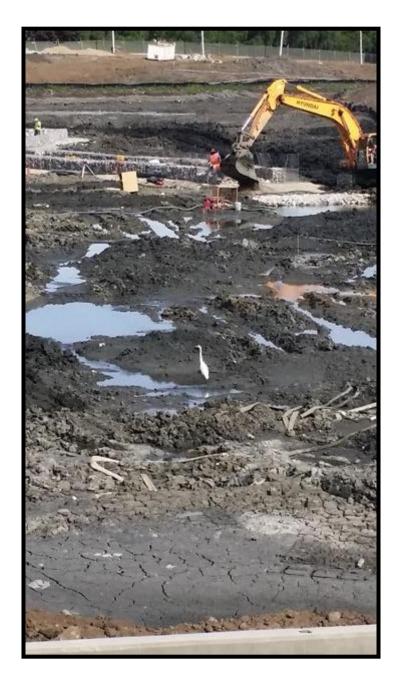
Photo facing northeast of C.S. Legacy crew building rock cage foundation and dredging with a Great Egret in the foreground.
